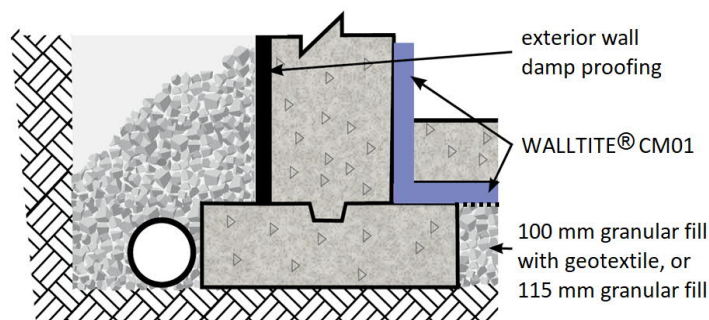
Application of “WALLTITE® CM01” for radon control beneath concrete slab, with geotextile/100 mm gravel or without geotextile/115 mm gravel bed.
